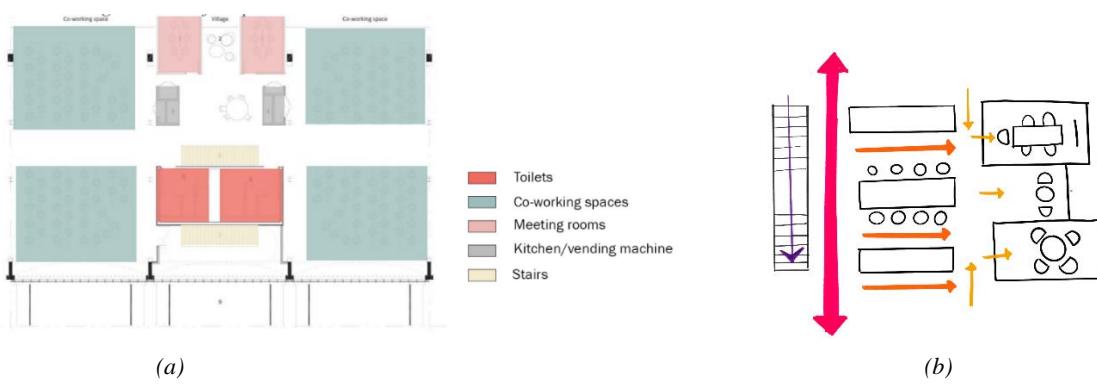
(a) Typical Village Plan (ArchDaily) (b) Conceptual Analysis (Author)
